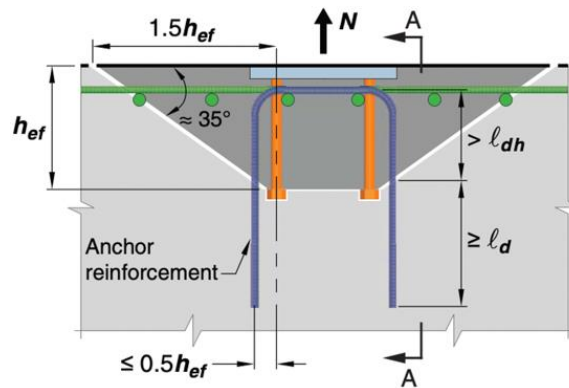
Example of anchor reinforcement for tension from ACI 318-19 [12]
